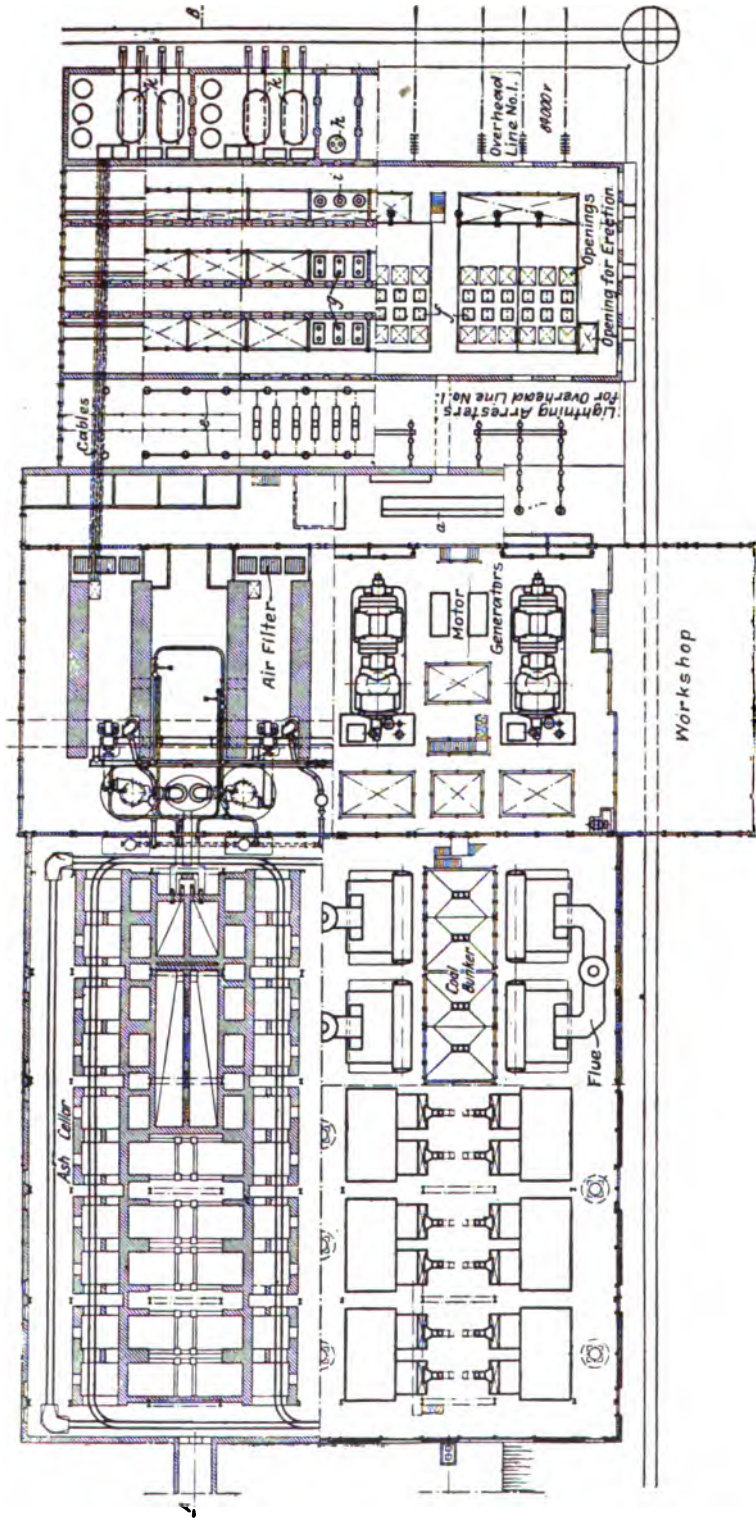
Vercening Power Station. Plan of Boiler House, Engine Room, and Switch House.
